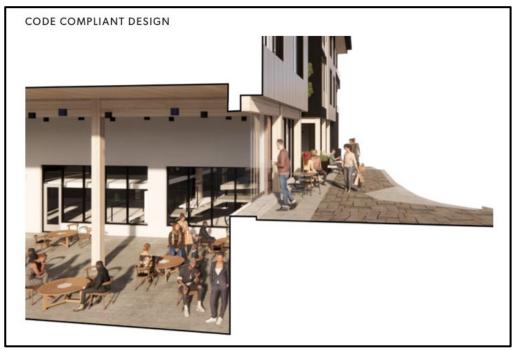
Sunken Hole at Street Corner (Project Plans Page 45)
